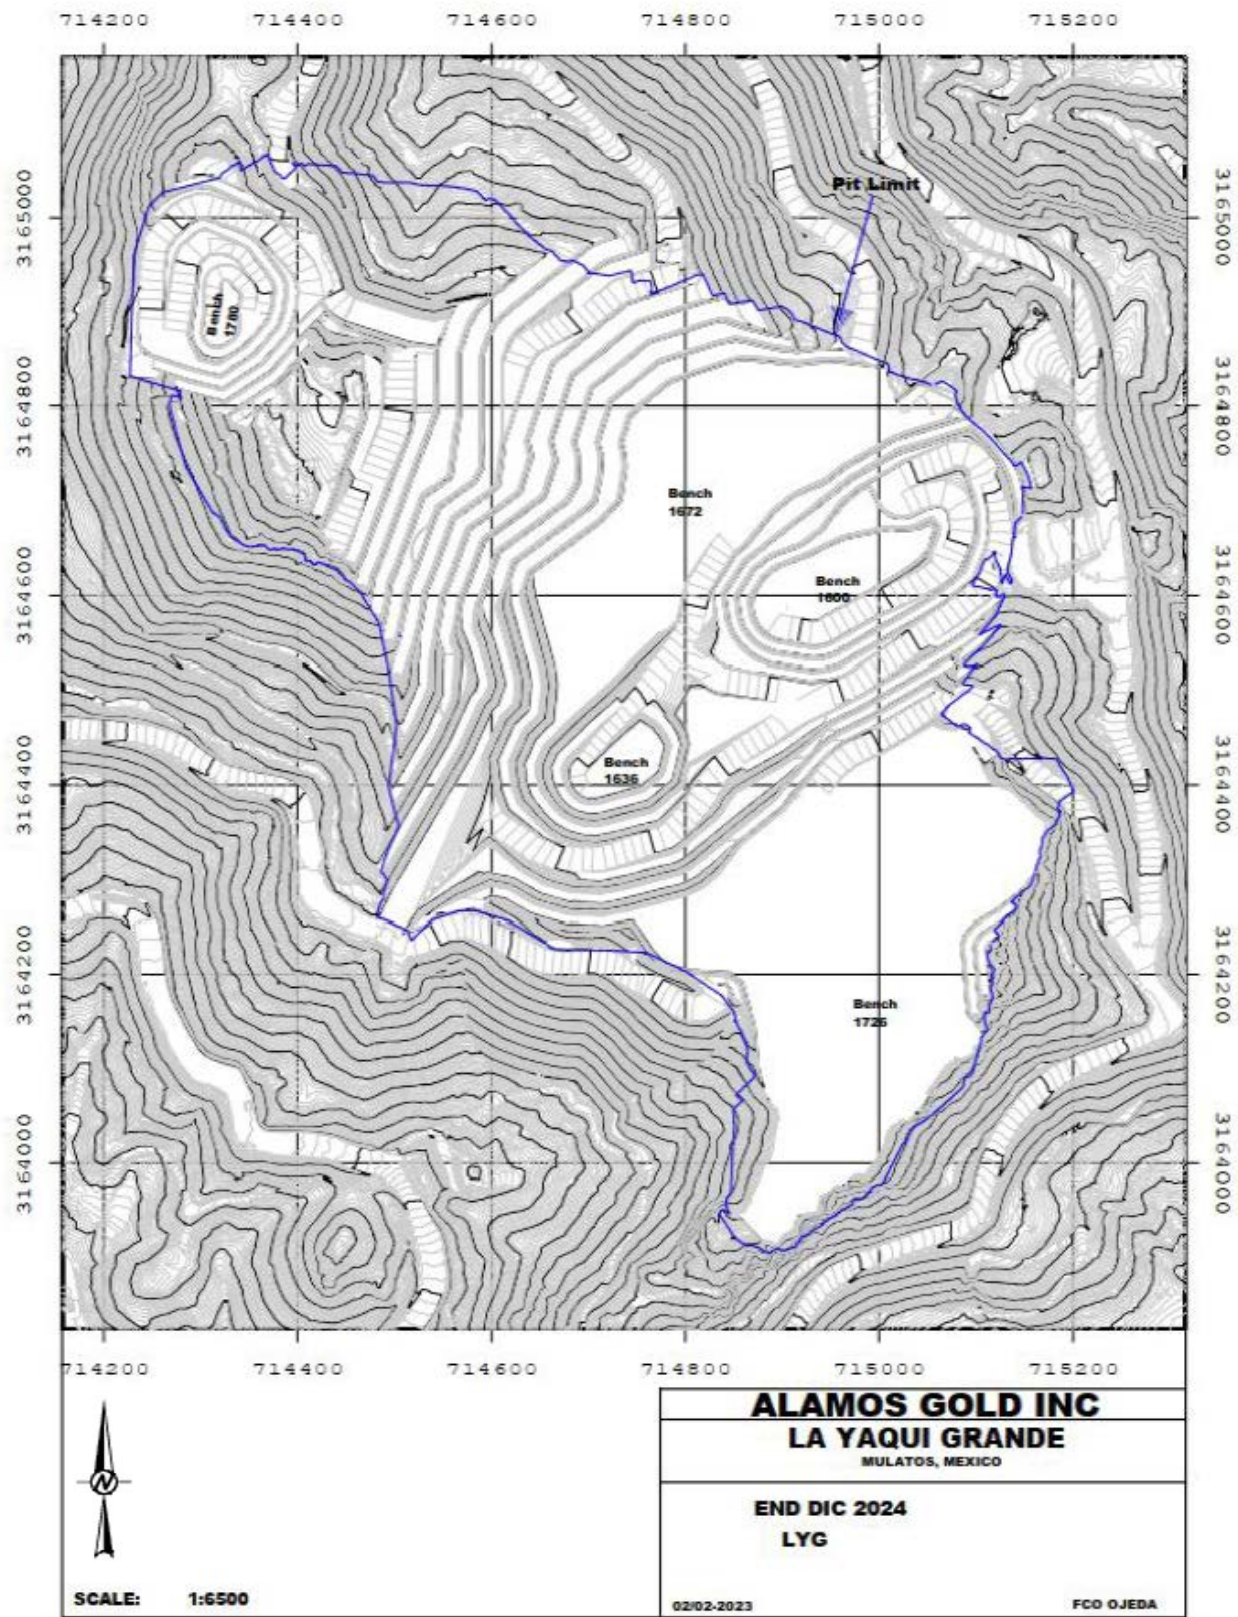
La Yaqui Grande Pit Plan, End of 2024
